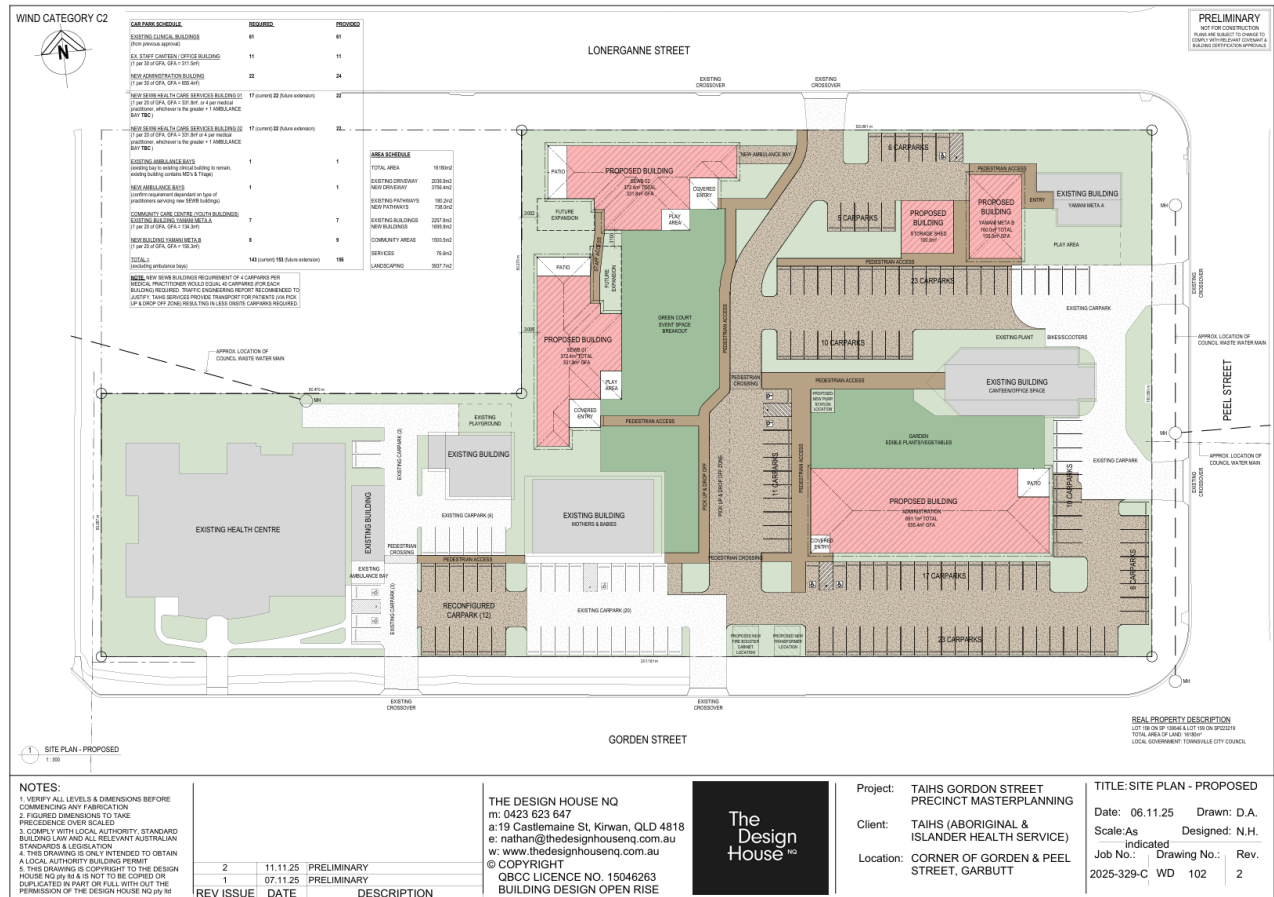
Townsville Aboriginal & Islander Health Service Redevelopment Plan
